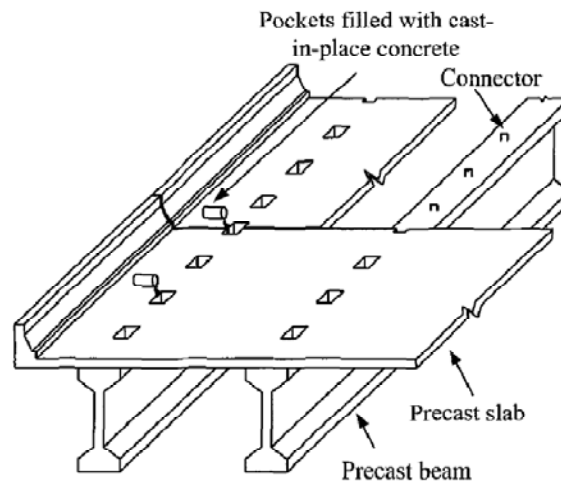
Precast girder and deck system (Araujo and Debs 2005)
